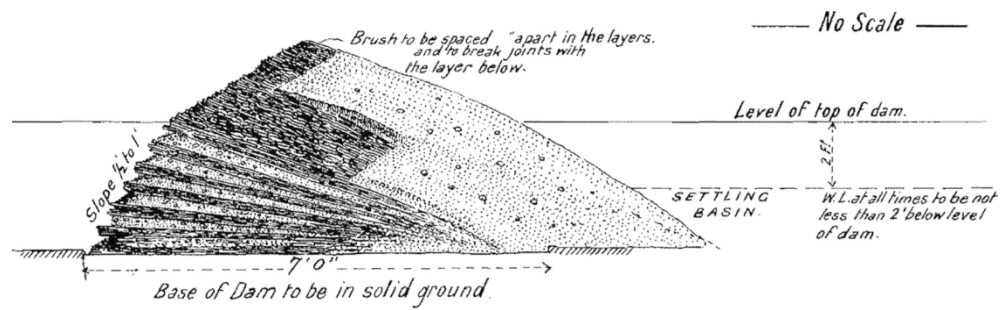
Example of sludge dam construction recommended by the Sludge Abatement Board, with green branches alternating with layers of earth or gravel (source: SAB 1907)
